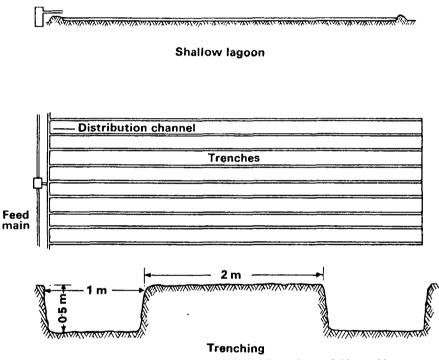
Disposal of liquid sludge by (a) shallow lagooning, and (b) trenching
